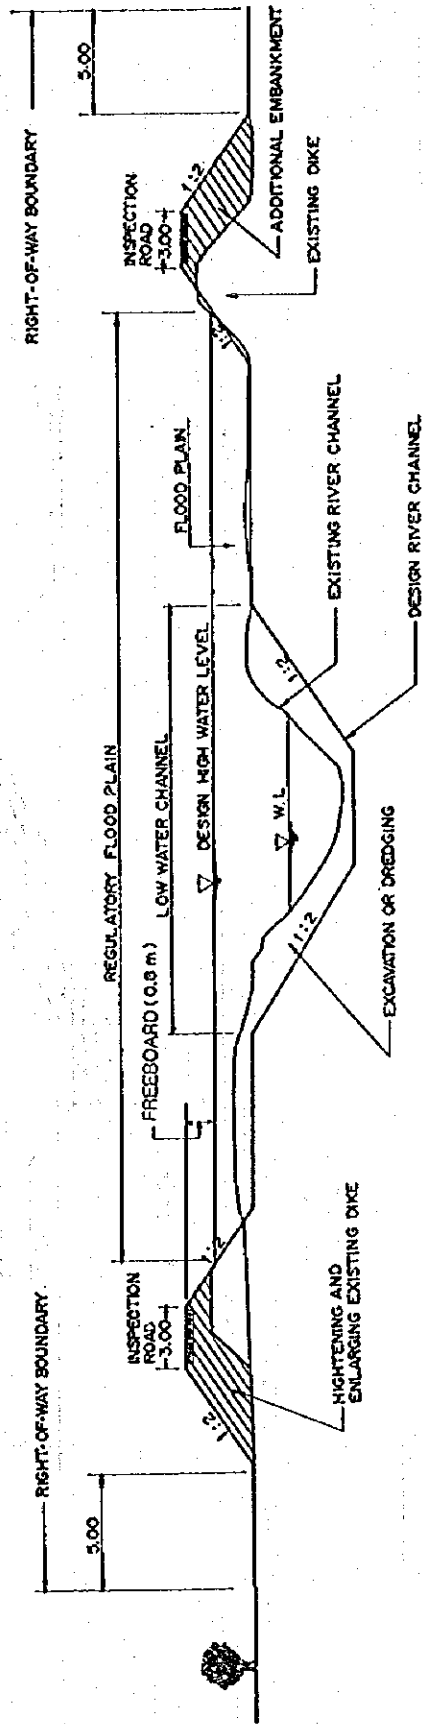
CROSS SECTION OF PROPOSED DIKE
